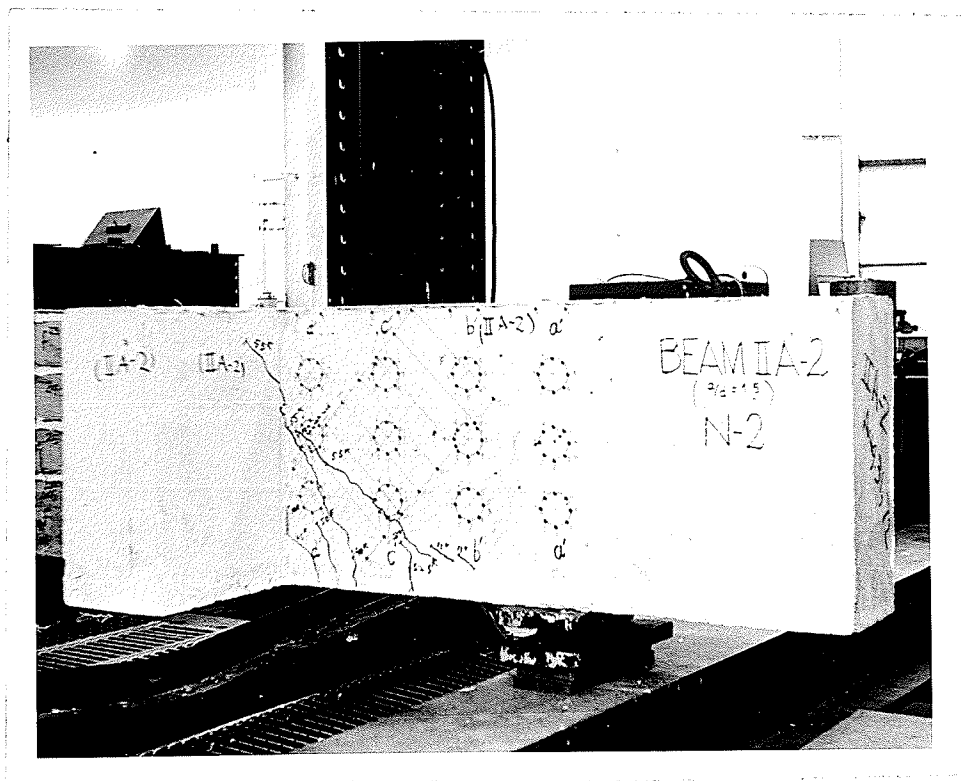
BEAM IIA-2 SHOWING LOCATION OF DEMEC GAUGES AND CRACKS
